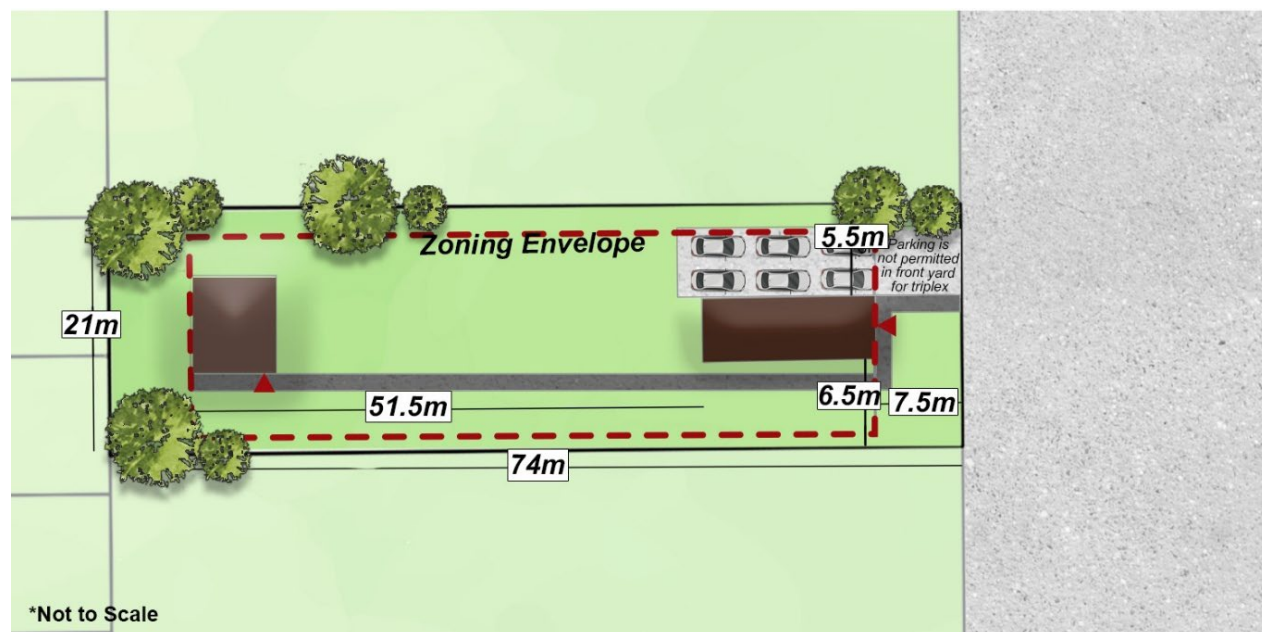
Triplex Interior Lot with Frontage on Highway 48 Concept Plan
